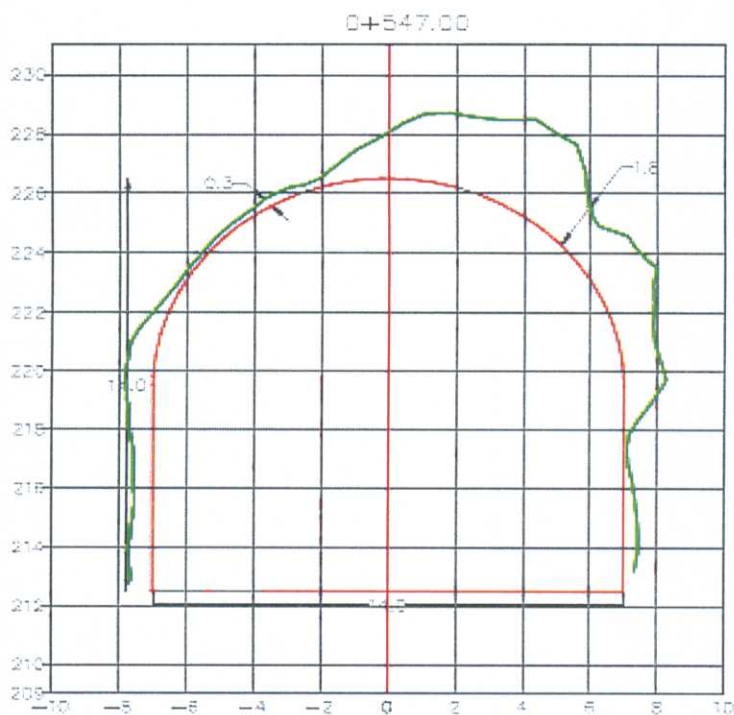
Comparison between Designed and As-Built cross section at 0+547
